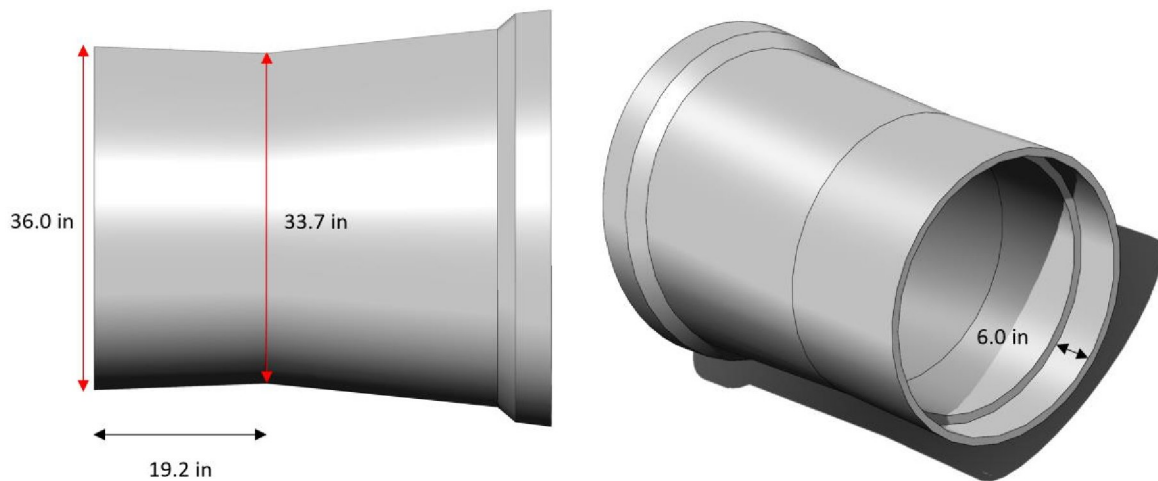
Section of the diffuser connected to the pre-existent culvert.
